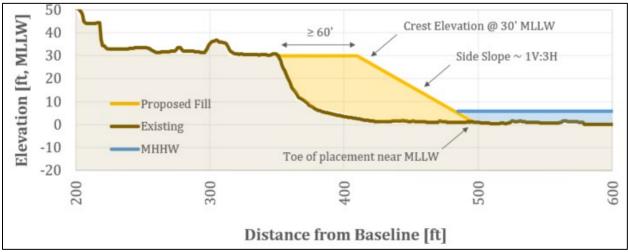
Example Cross-Section 27. (Plan View location shown in Figure 7)
